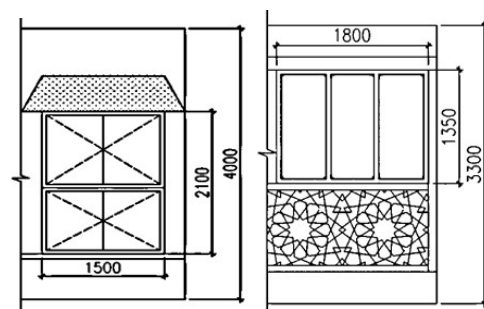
Typical Window Size and style of Existing and Proposed Development
